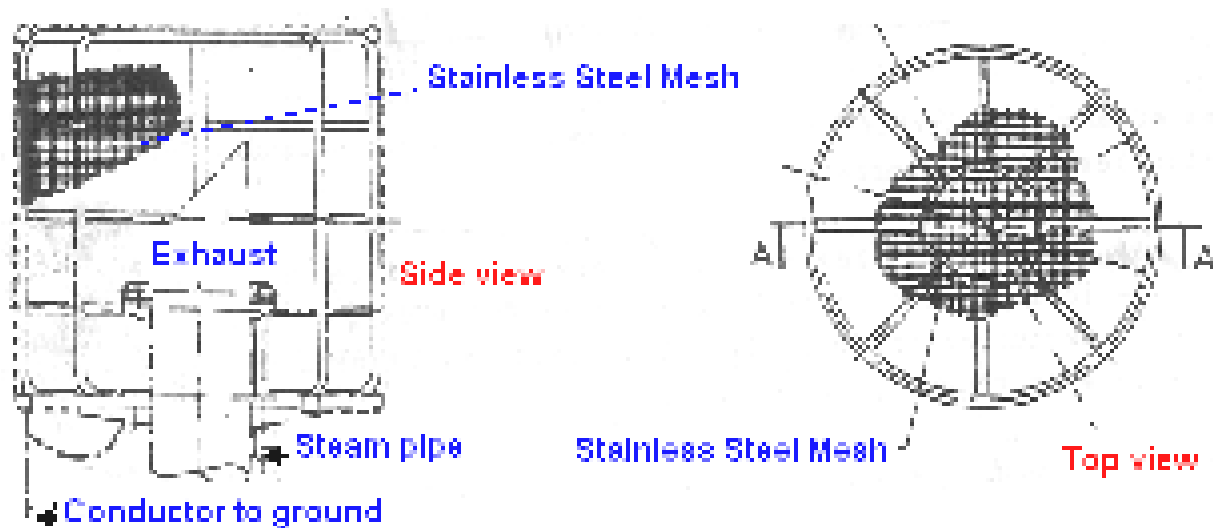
Faraday or mesh cage installed on top of an exhaust pipe (chimney)
